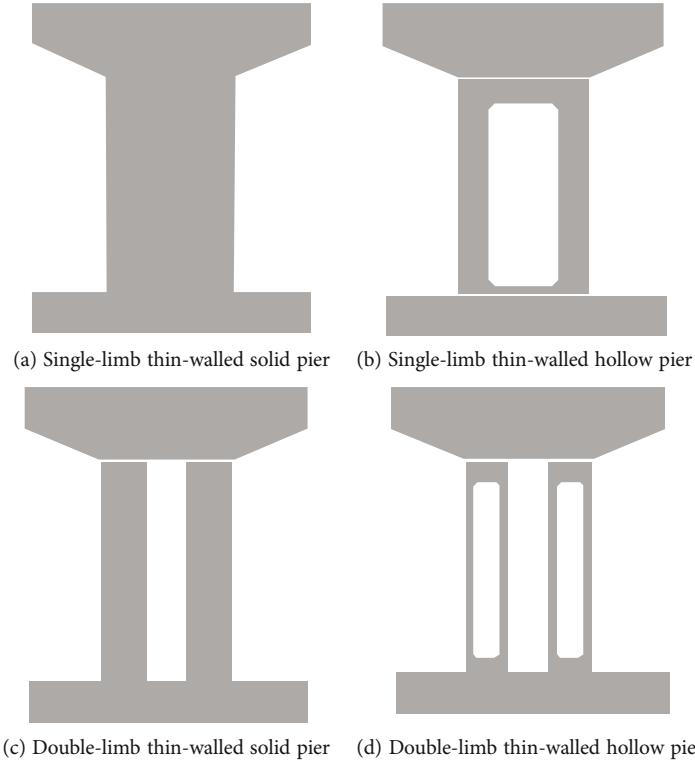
Cross sections of different piers of continuous rigid-frame bridges.
